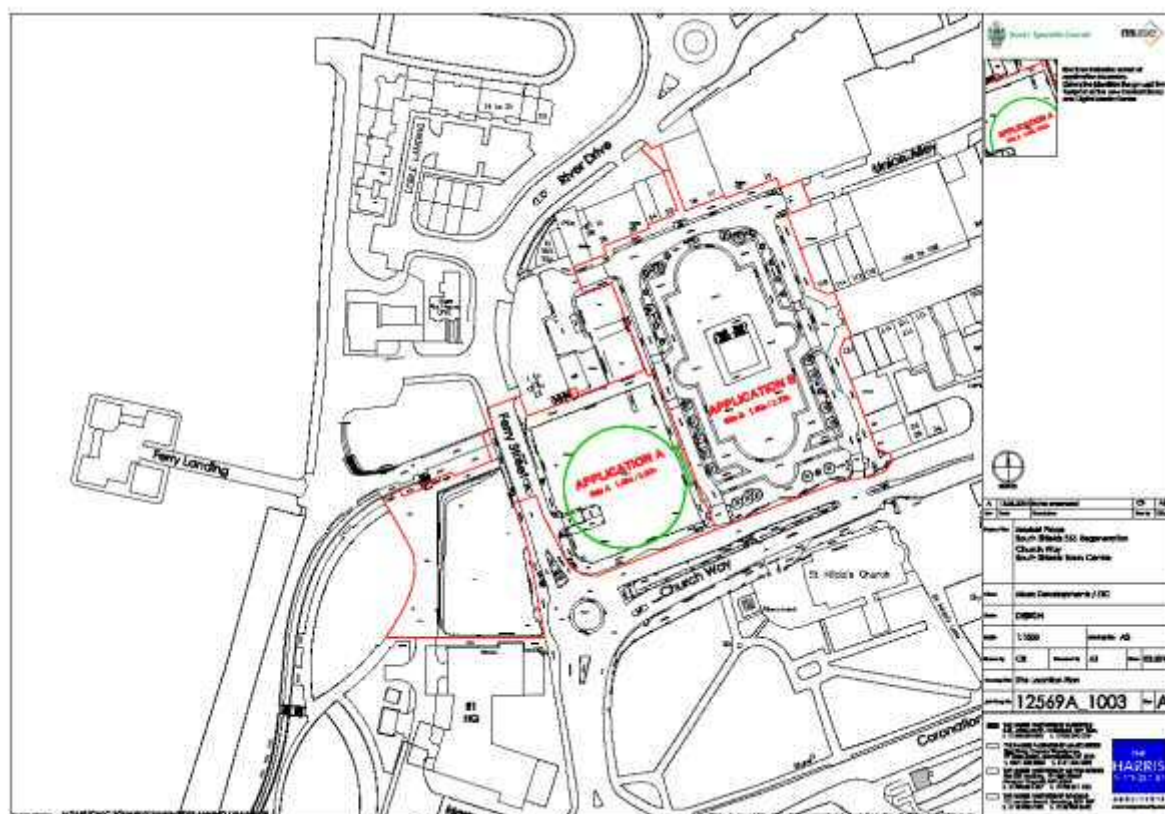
SITE LOCATION (DRAWING 12569A_1003A_SITE LOCATION PLAN_A3)
